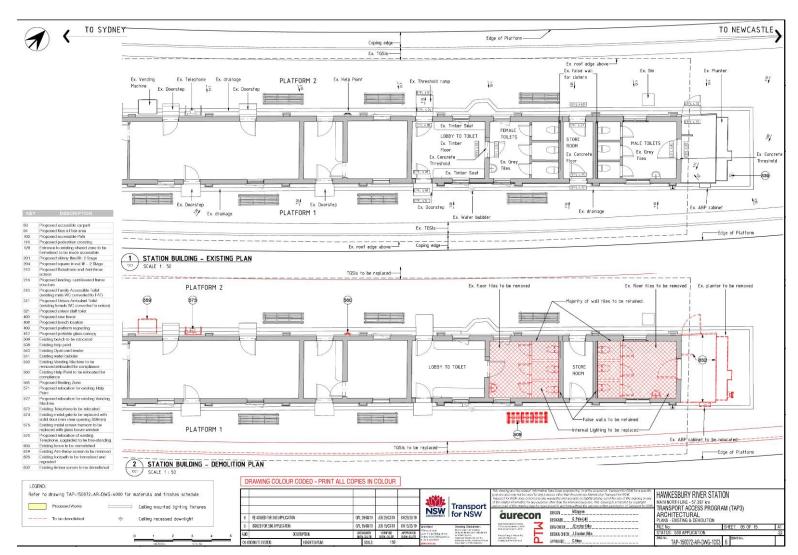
Plan view showing the current layout (top image) and proposed areas to be changes (lower image) to the current station building.
